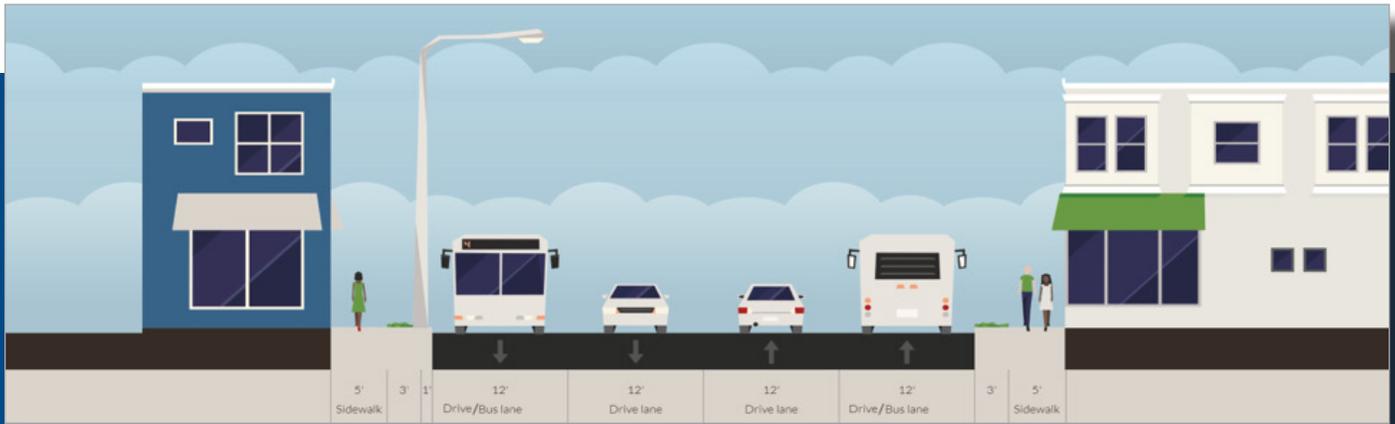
(above): Hardesty to Beacon Existing Street Profile
